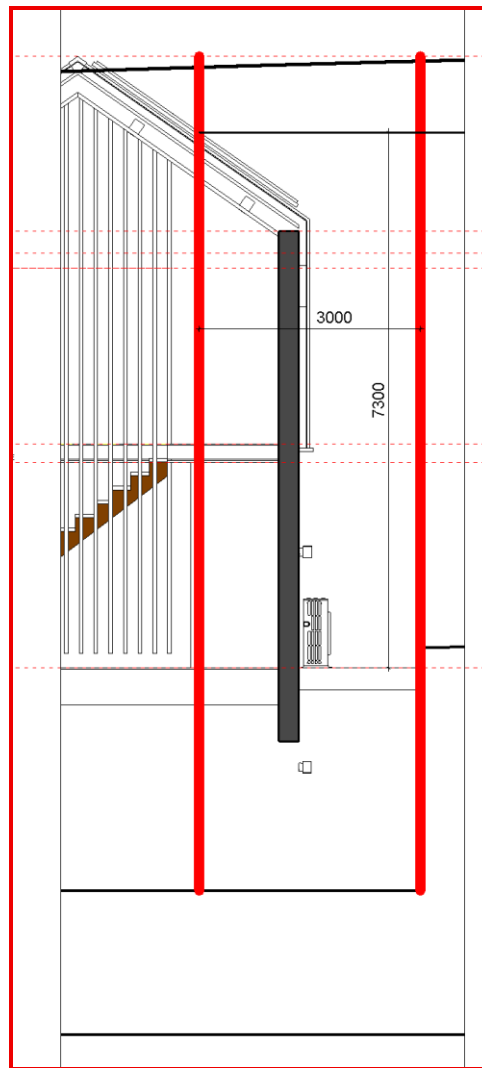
Extract of Sectional Title Plan D.17/2024 showing distances from main dwelling to boundary
